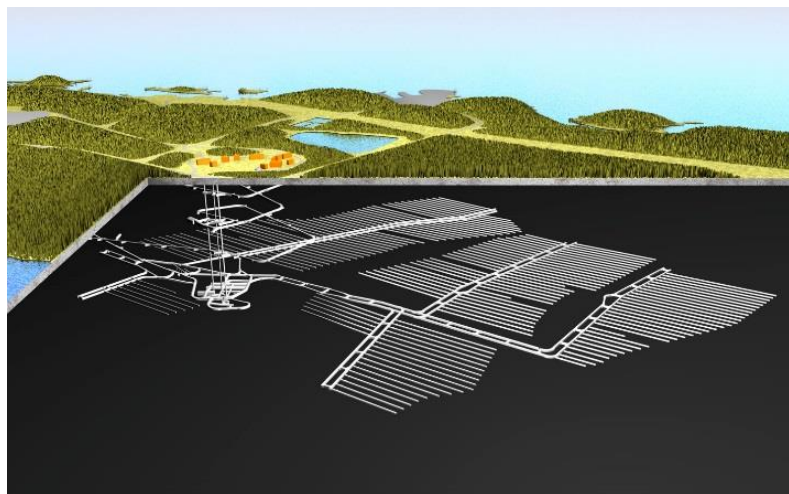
The facility contains deposition tunnels, central tunnels and technical auxiliary facilities.
